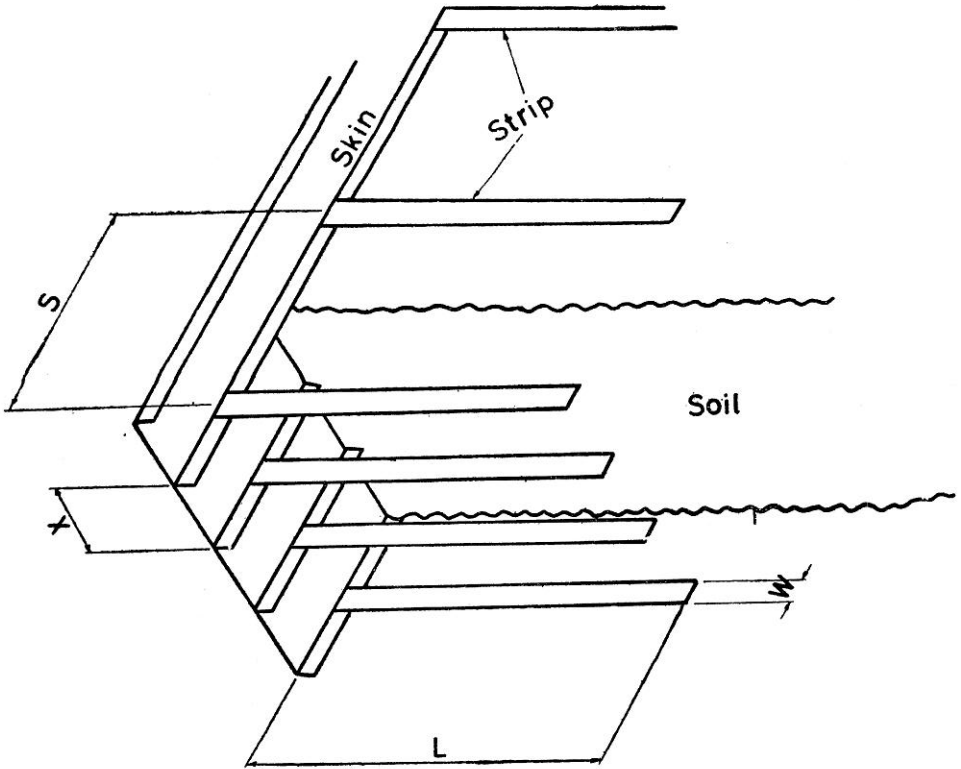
Placement of Strips in Reinforced Earth Wall
